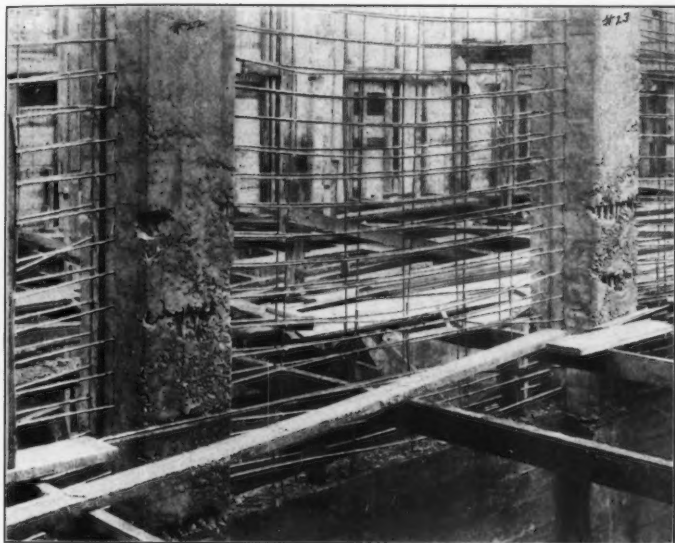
REINFORCEMENT OF WALLS AND COLUMNS.
